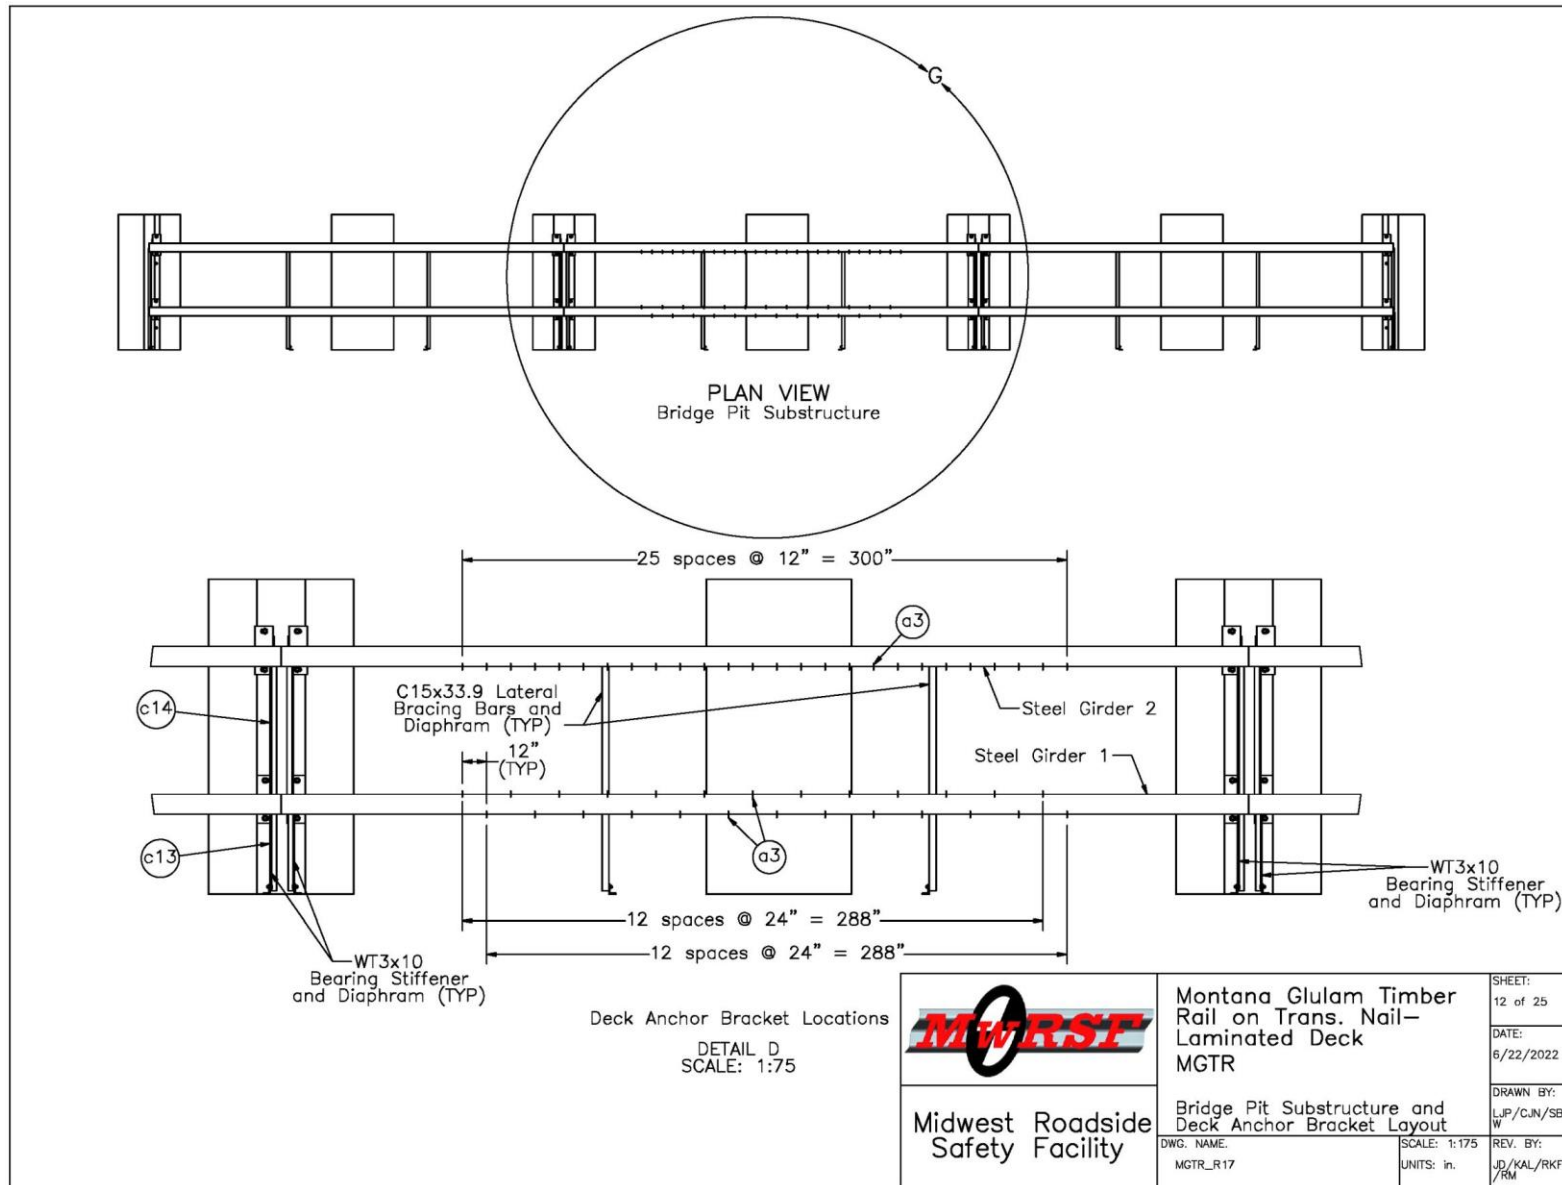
Bridge Pit Superstructure, Substructure, and Deck Anchor Bracket Layout, Test Nos. MGTR-1S and MGTR-1D
